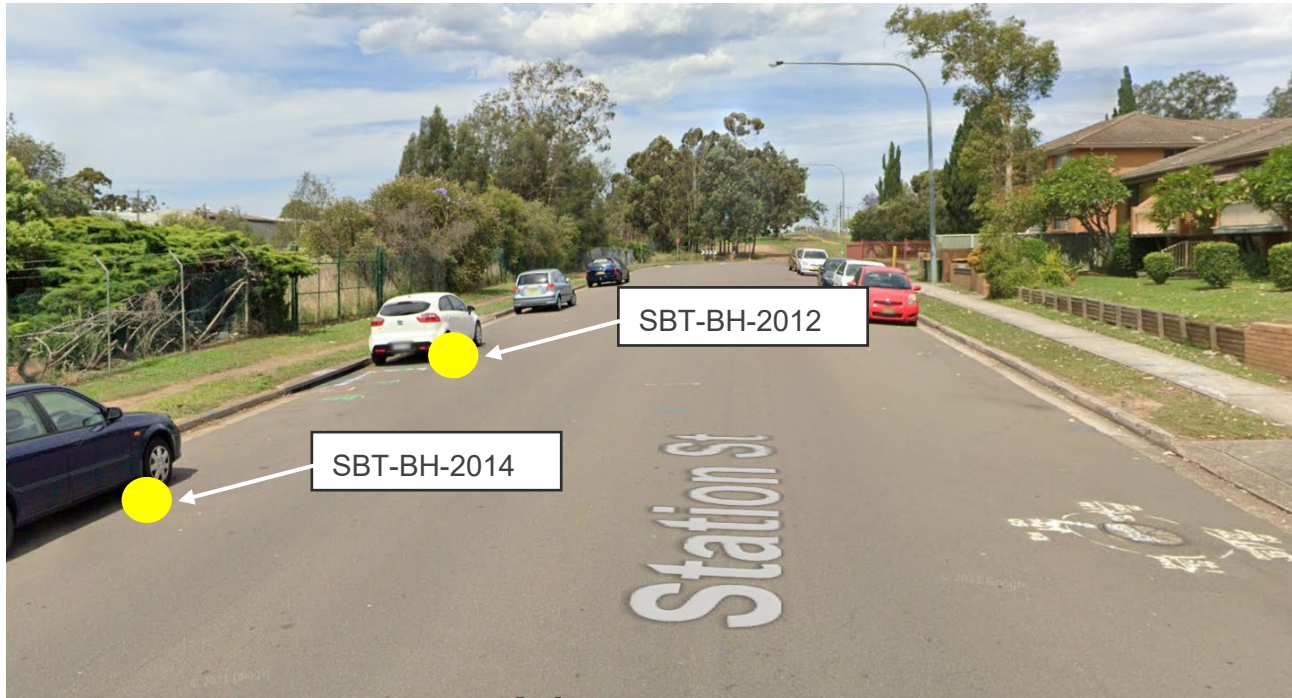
Street view of Station Street (Eastbound) showing proposed investigation location
